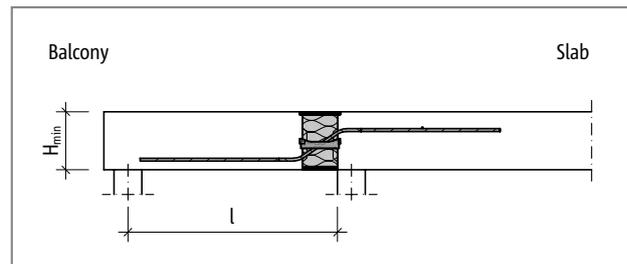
Schöck Isokorb® XT type Q: Static system (XT type Q-V5 to V8)
